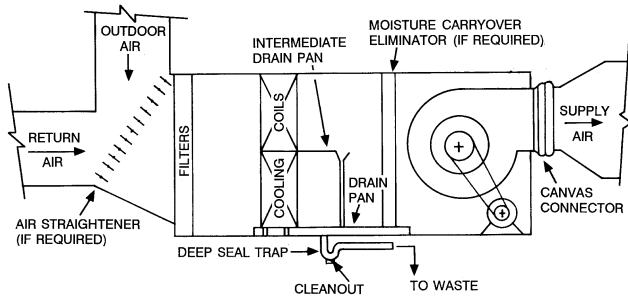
Typical Arrangement of Cooling Coil Assembly in Built-Up or Packaged Central Station Air Handler
